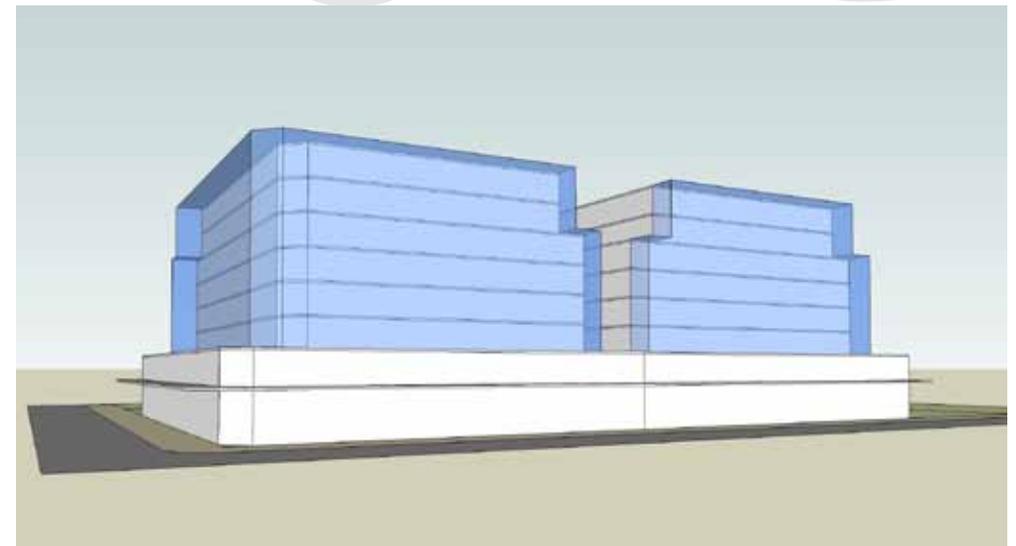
T&G BUILDING ON THE CORNER OF WOOD AND VICTORIA STREETS
